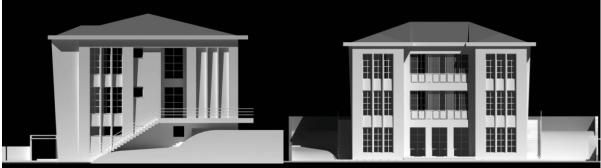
Side façade, main façade (proposed dwelling) source: Klodjan Xhexhi
